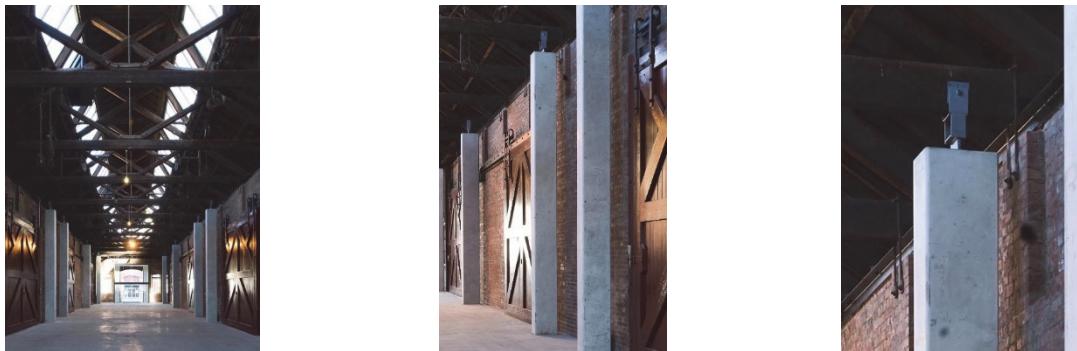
Internal space of Shed 13 showing new frame and detail of ductile link to roof trusses.
